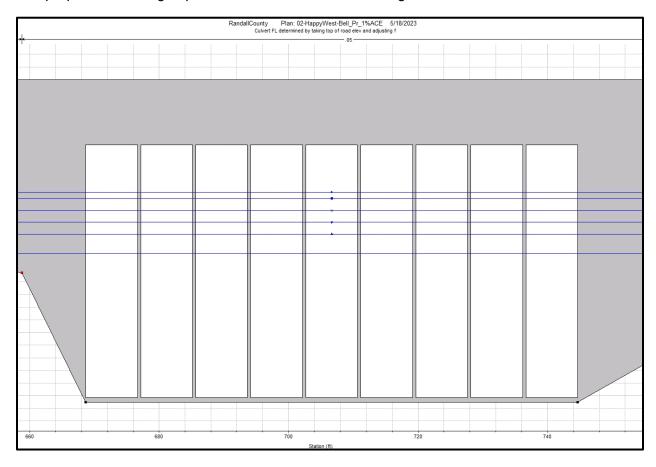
Proposed 1% LOS upstream cross section at Happy West Road crossing of Happy Draw.
